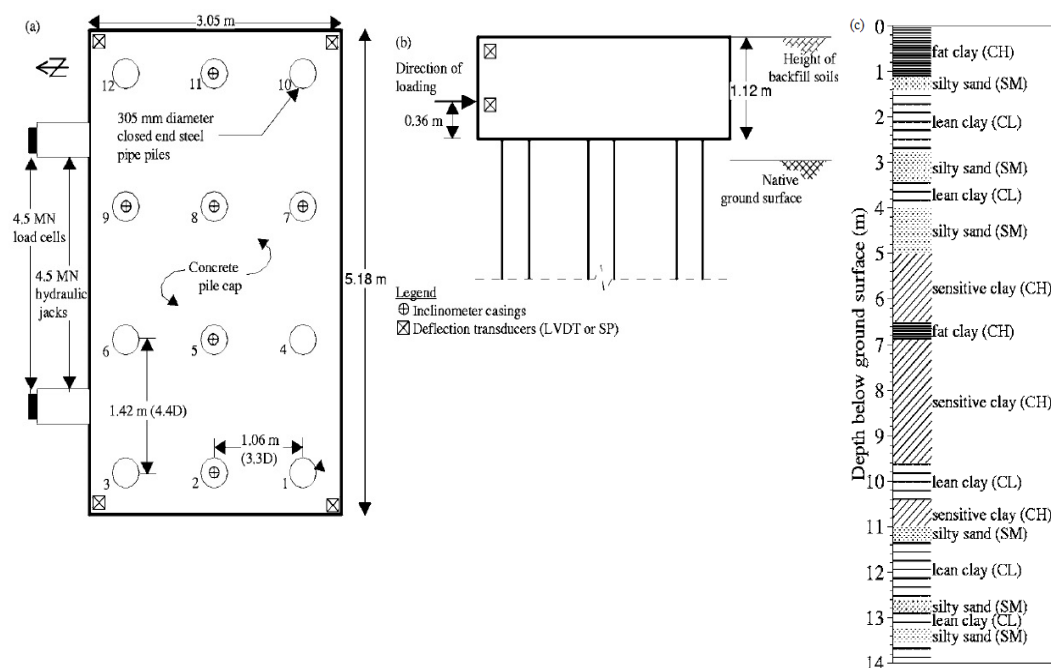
Field Test Setup on Pile Cap (a) Plan, (b) Elevation View, and (c) Foundation Soil Profile (Rollins and Cole, 2006).
